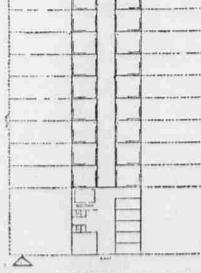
FIG. IL. GROUND PLAN OF HOG HOUSE the roof on the north side and alley is made steeper so as to have more air
